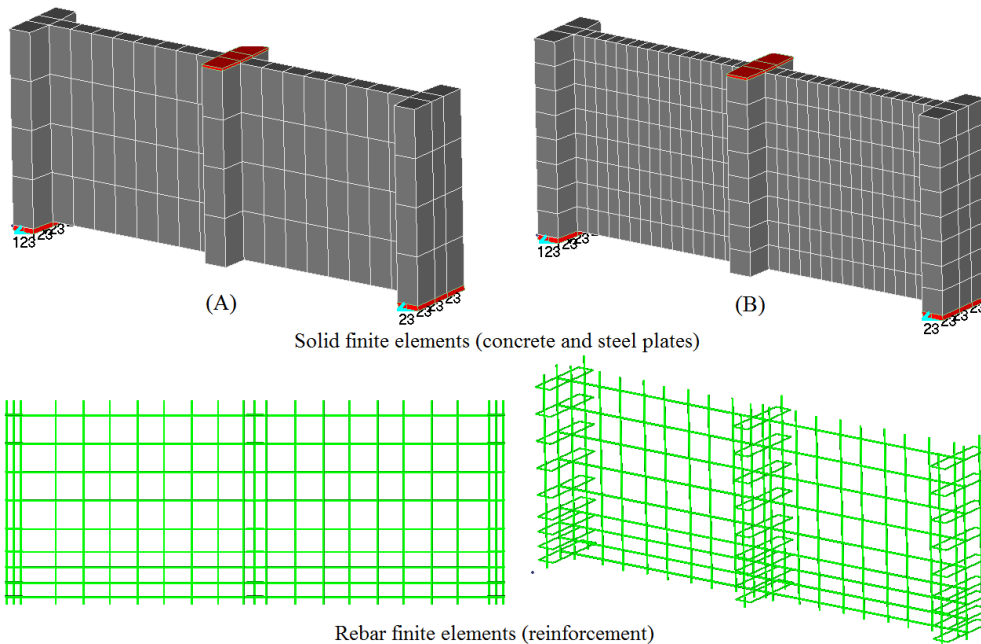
RC SHEAR PANEL BEAM W-2. FE MESH WITH (A) 100 AND (B) 328 CONCRETE HEXAHEDRAL ELEMENTS.
